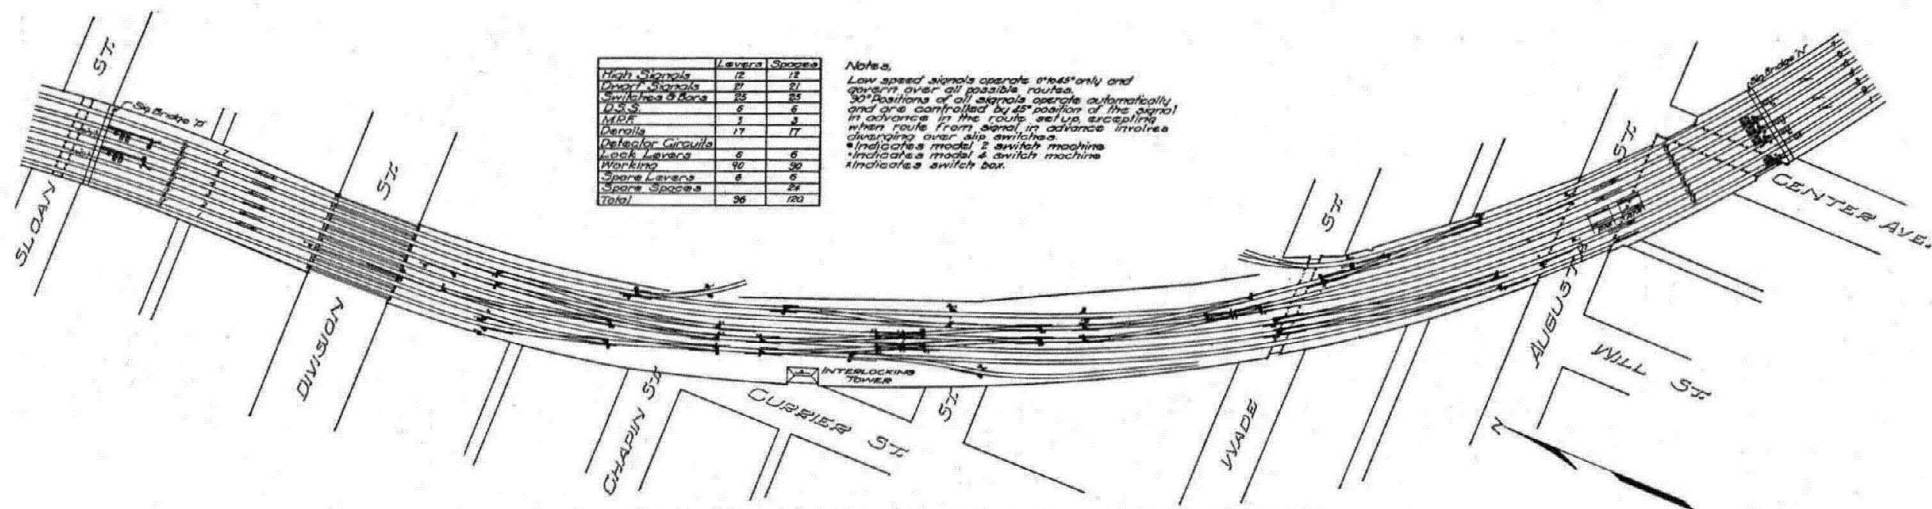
Plan of Division Street Interlocking, on the North Approach.
